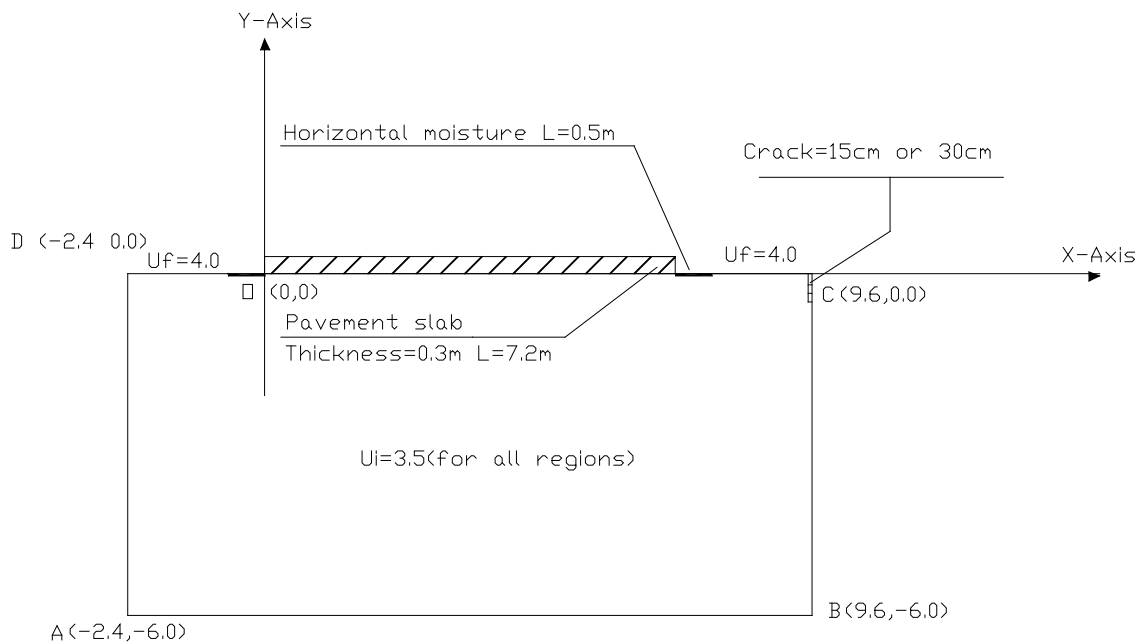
Finite Element Method Model Geometry and Boundary Conditions
